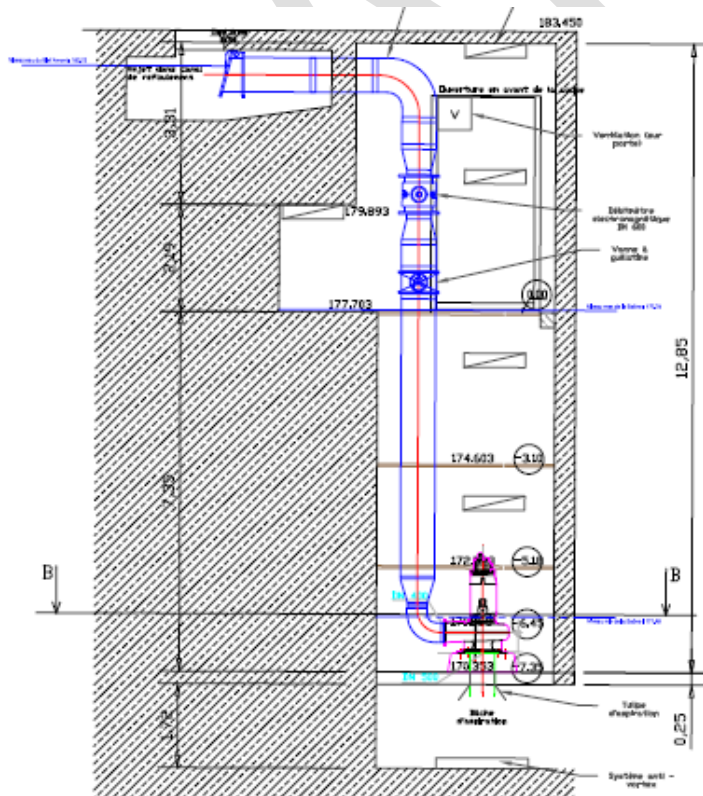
Proposed Arrangement with Dry Well Submersible Pump and Flowmeter
